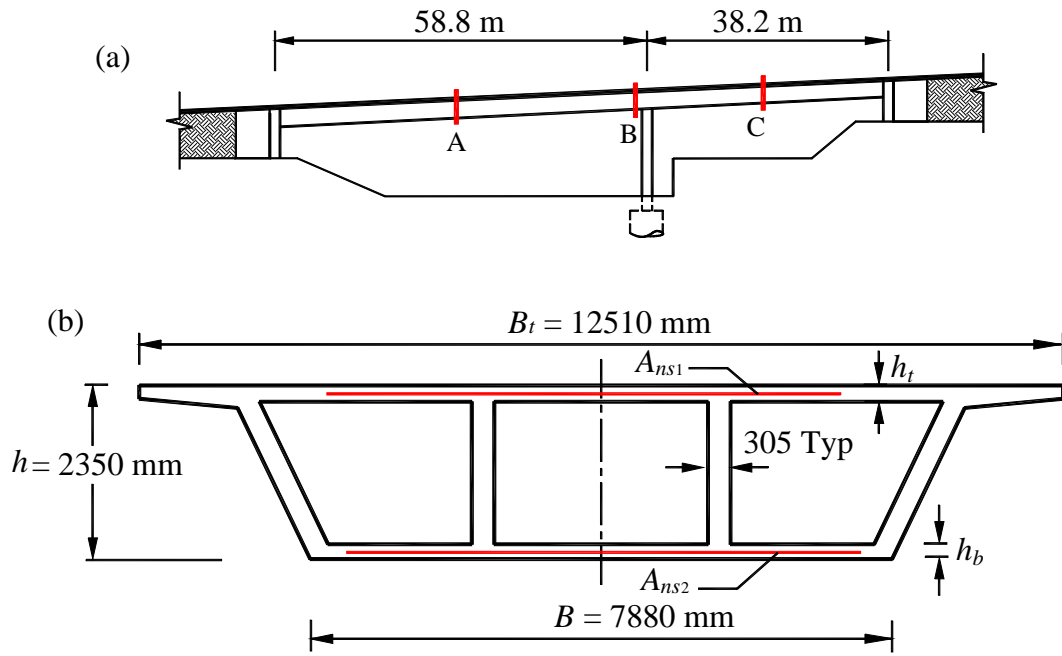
Duenda Road Over crossing: (a) Elevation; and (b) Cross section.
